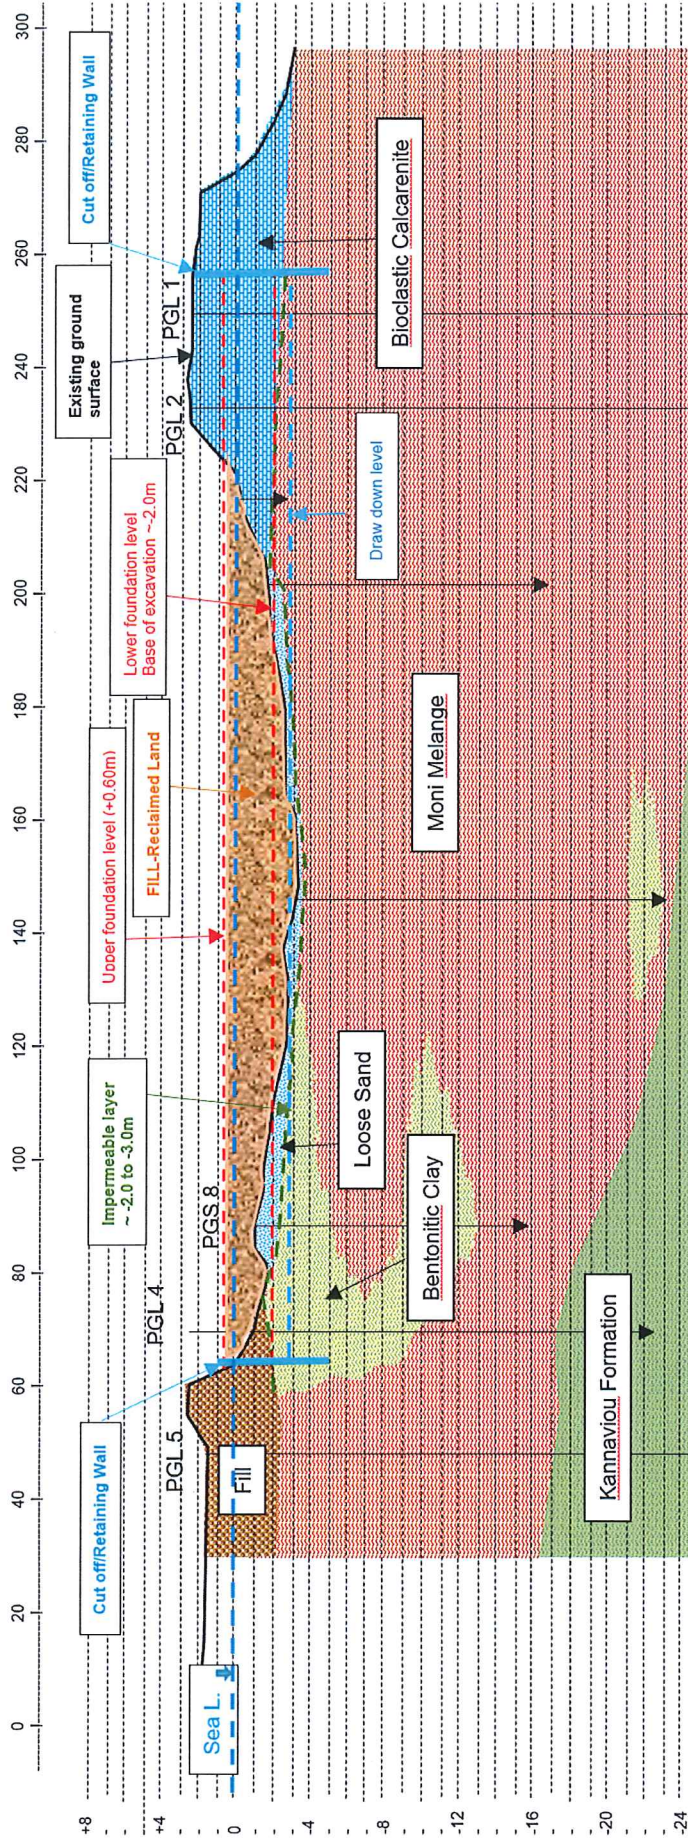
Geological Cross Section (N/S direction) showing details of foundation, excavation levels, required drawdown and cut off walls
